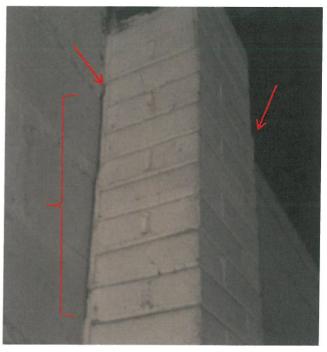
Brick pier horizontal shift at top 1/3 point See red arrows.
